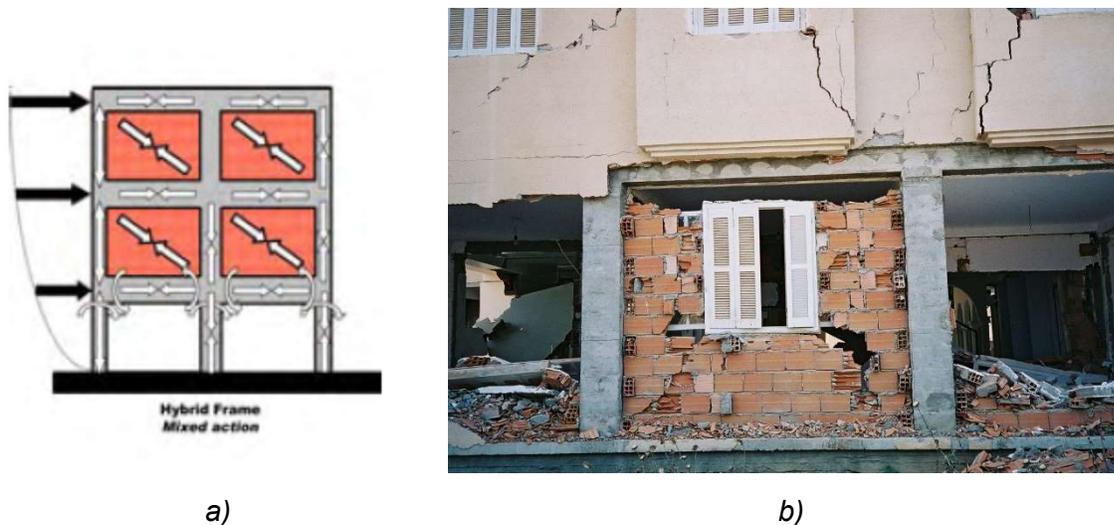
Soft storey mechanism: a) vertical discontinuity in masonry infills²; b) building damage in the 2003 Boumerdes, Algeria earthquake³.
